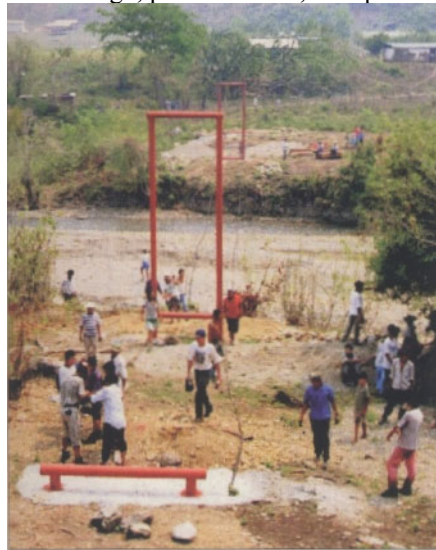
The 51-m suspension bridge under construction over the Yuri river, Honduras
